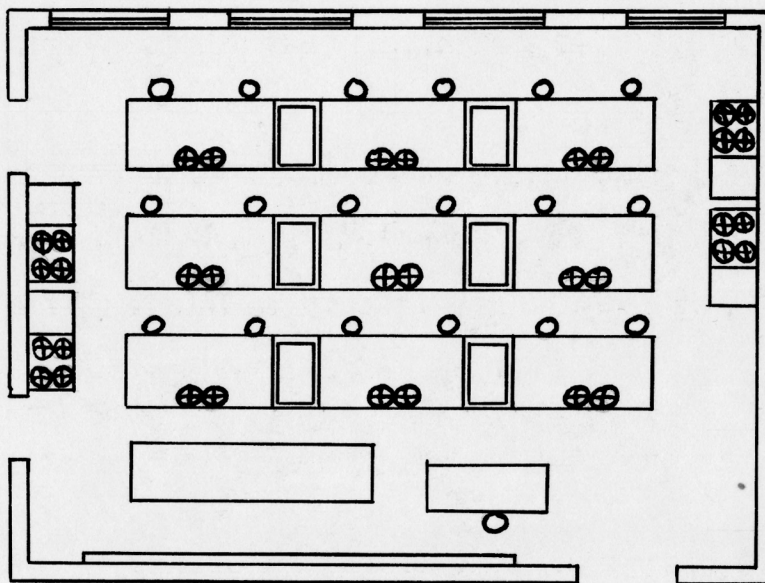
Parallel Row Type of Arrangement in Foods Laboratory.
